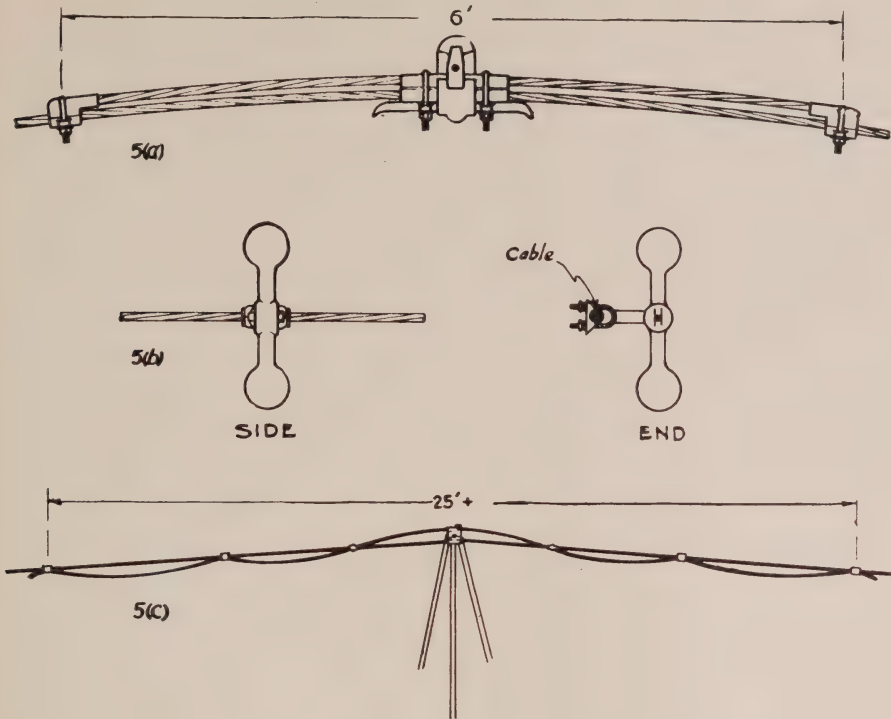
(a) Conductor reinforcement on first (1927-28) construction.
